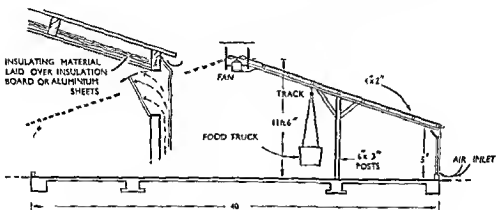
A—SECTION OF BROILER HOUSE OF CONVENTIONAL CONSTRUCTION
